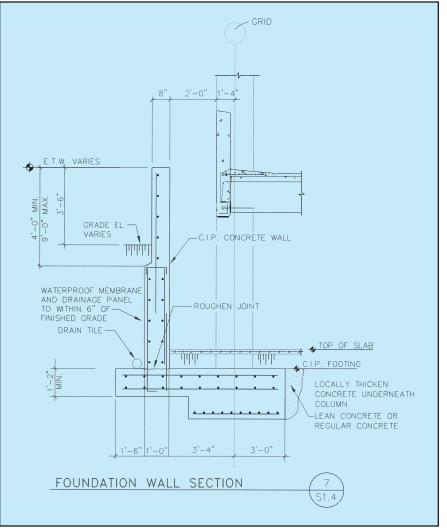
Cantilevered retaining walls were installed adjacent to some of the structures to relieve the lateral load from the retaining wall and provide expansion and contraction space.
